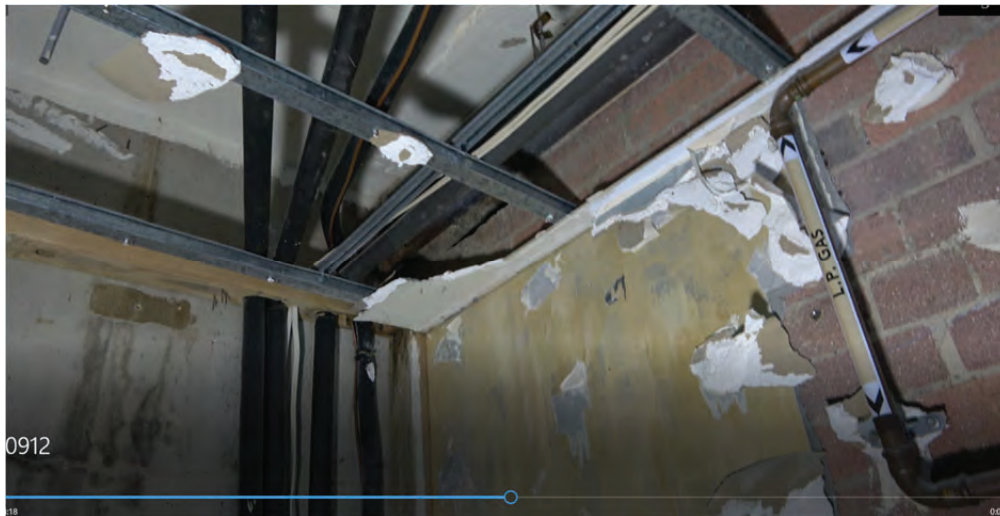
Wall at 3-G to H. Note horizontal cracks in rear retaining wall and mould. Also, perpendicular brick wall along grid H.
